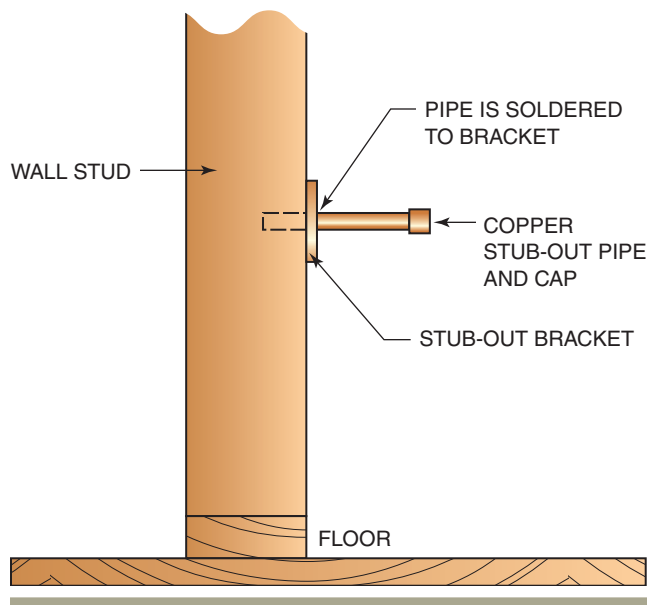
A copper stub-out pipe is soldered to the bracket to provide pipe stability.
